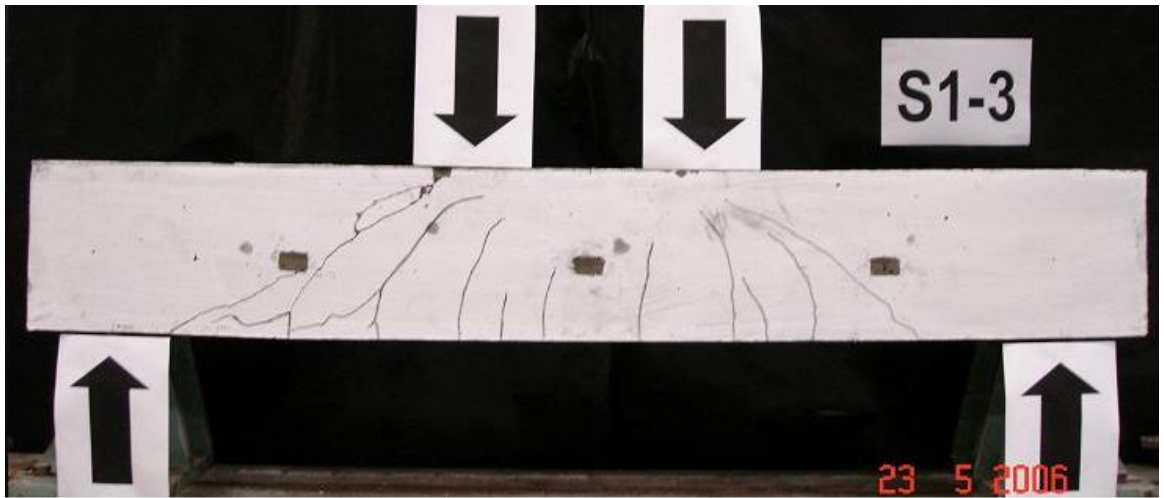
Overall Crack Pattern for Beam S1-3 (Front Face)
